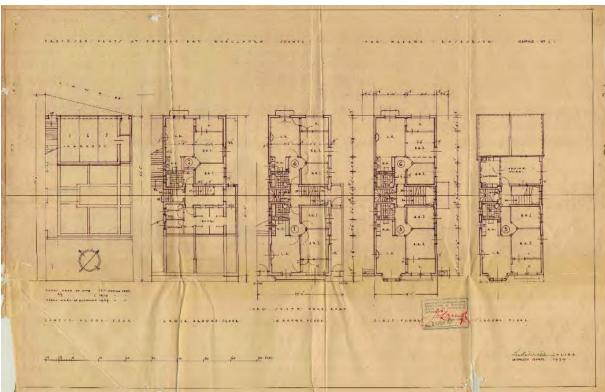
Architectural plans submitted with BA45/1934 (Source: Woollahra Records)
